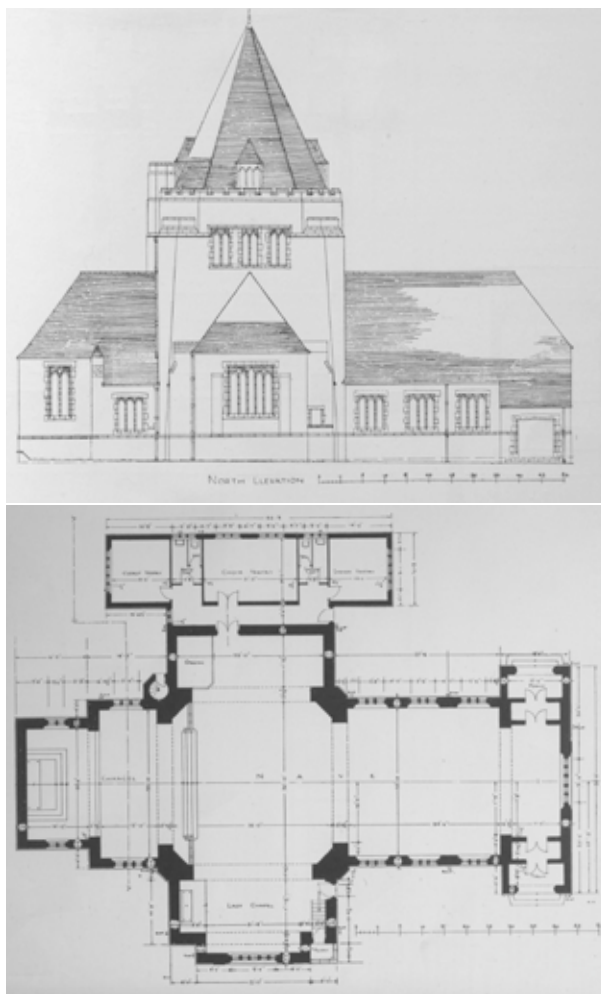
Plan, Elevation, and Section of St Alban's, Golders Green. *AJ*, 12 April 1933, pp. 489 - 90.
